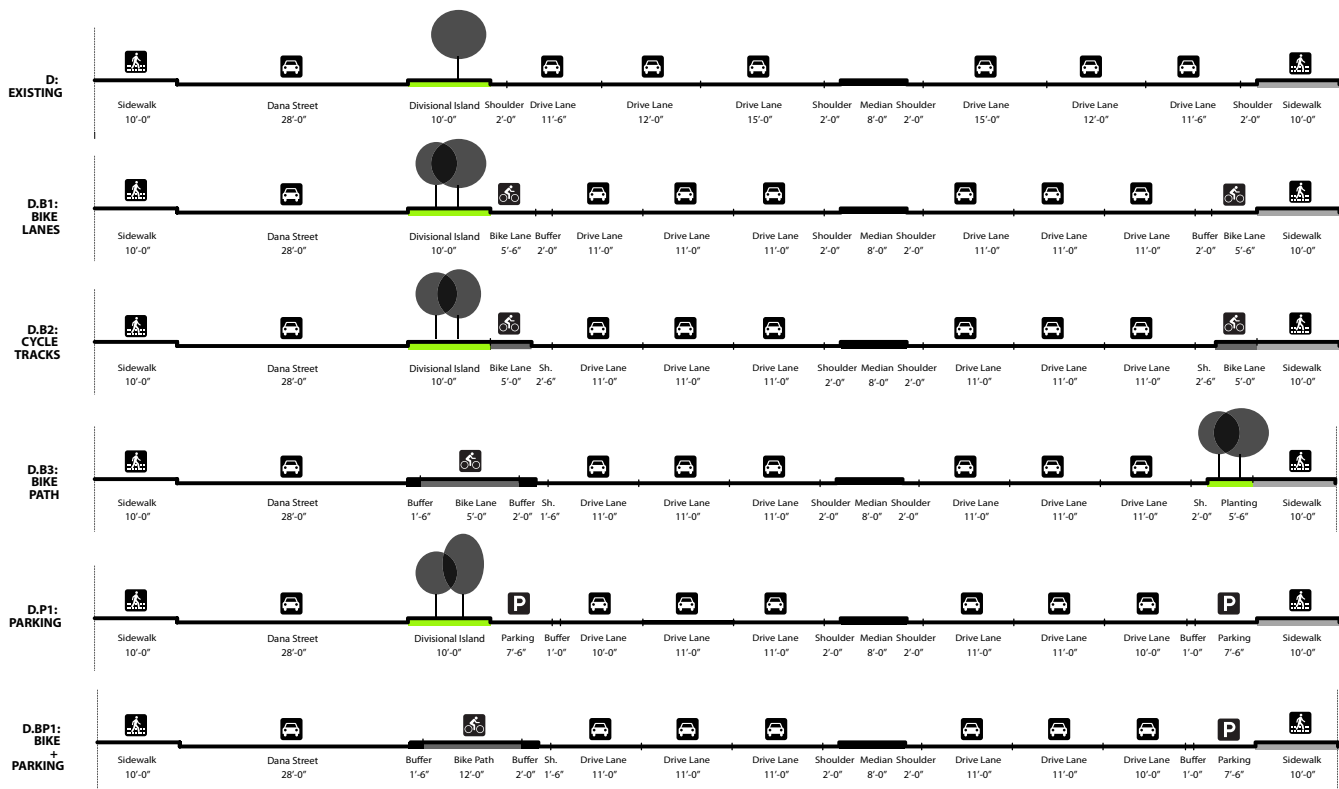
Conceptual Cross-Sections for McGrath Highway, North of Lowell Line Bridge
